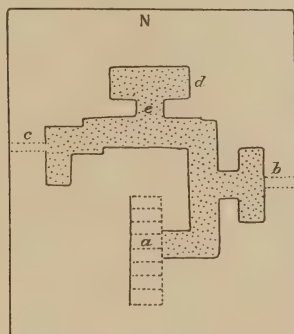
GROUND PLAN OF BLIND STORY OF TOWER.
